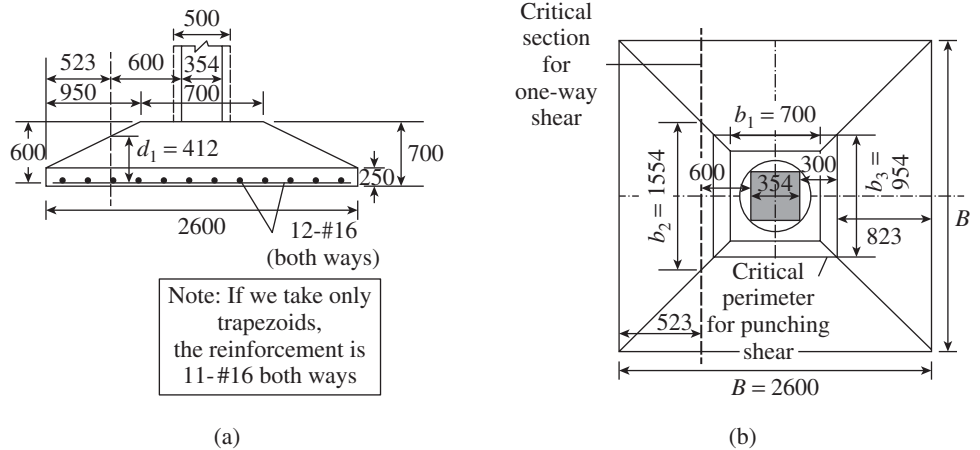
Sloped footing of Example 15.3 (a) Section (b) Plan
